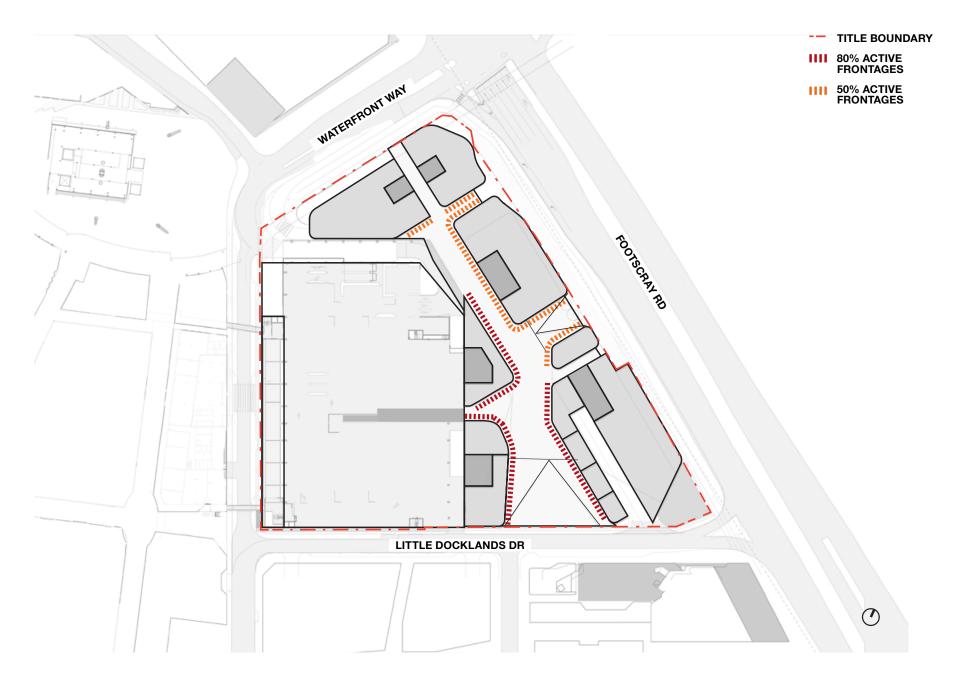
Concept Plan 5 - Level One Public Realm Activation
